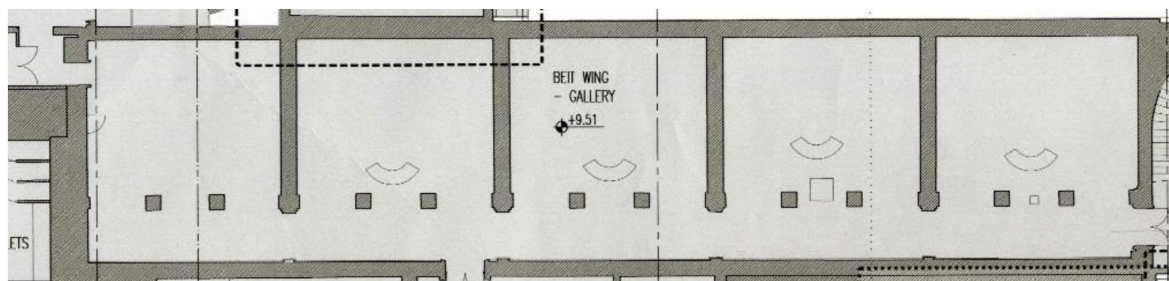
Exhibition architectural plan, Beit Wing, Rooms 6-10 (Source: National Gallery of Ireland, 2018)
